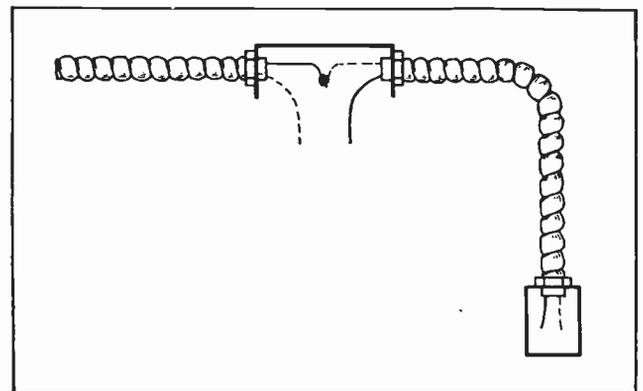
B. This sketch shows the manner in which the white and black wires in a polarized system are connected at the outlet boxes for ceiling lights and wall switches.
